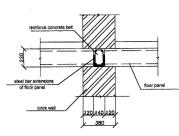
A: Critical Structural Details - Wall-Floor Connection Showing Reinforced Concrete Bond Beam (belt) Reinforcement
